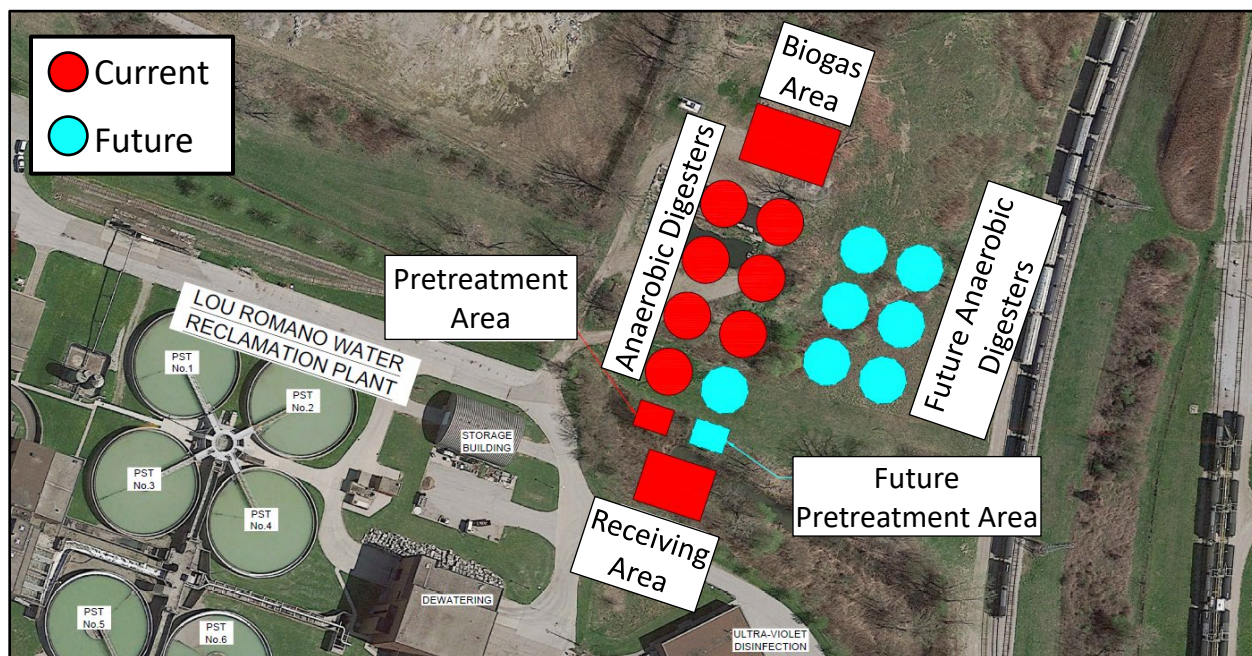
Potential Site Layout at the Lou Romano Water Reclamation Plant
